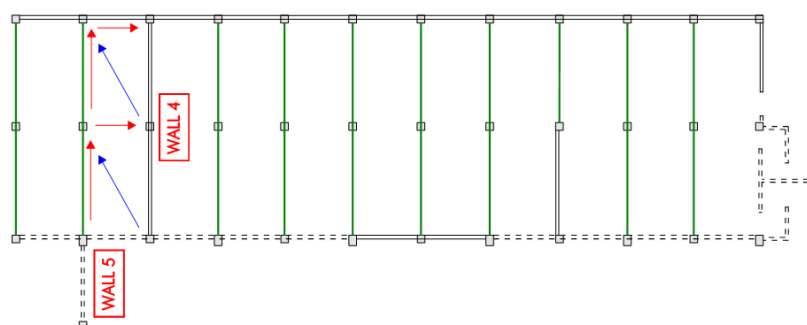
Diaphragm Shear transfer from Wall 5 to Wall 4
